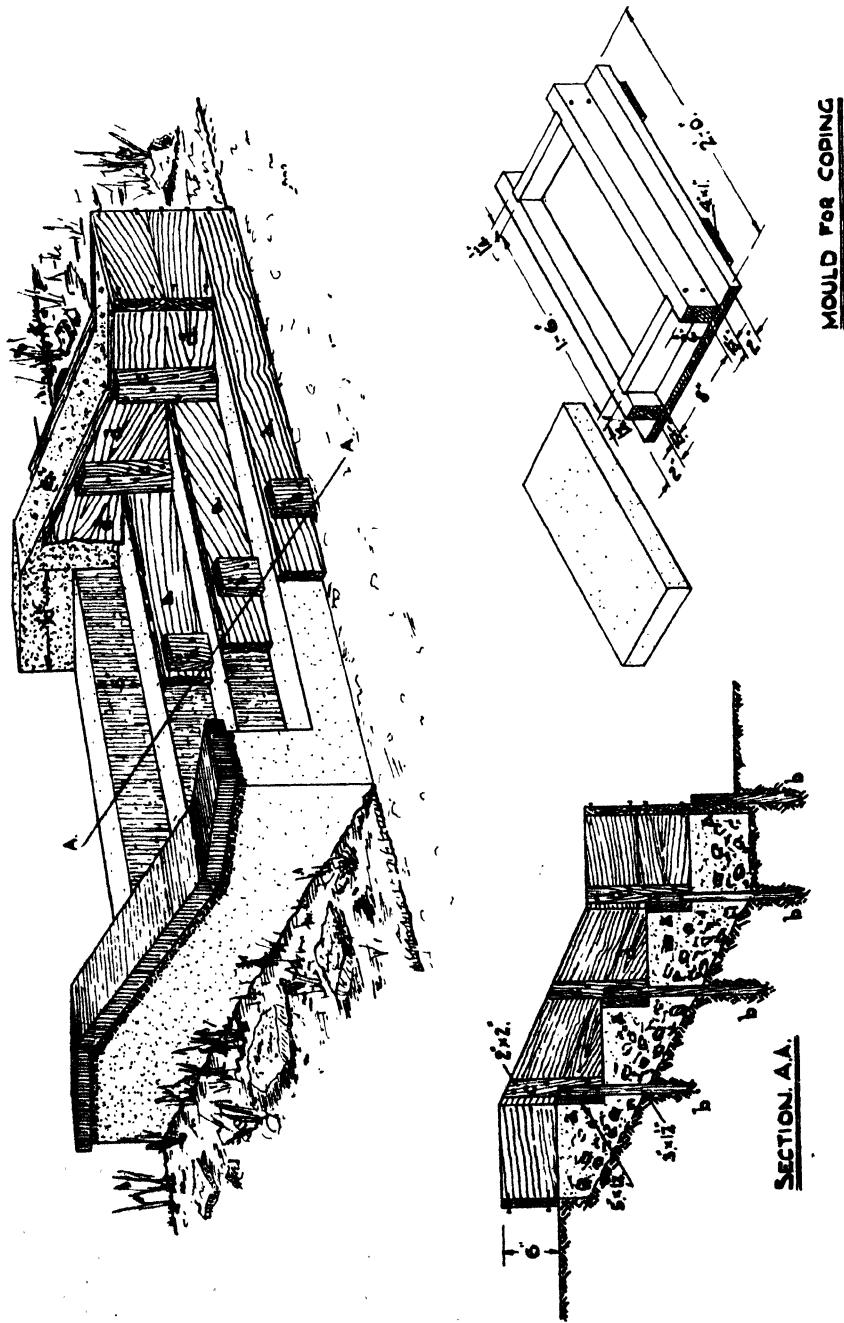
HOW TO ERECT GARDEN STEPS IN CONCRETE ON SITE
